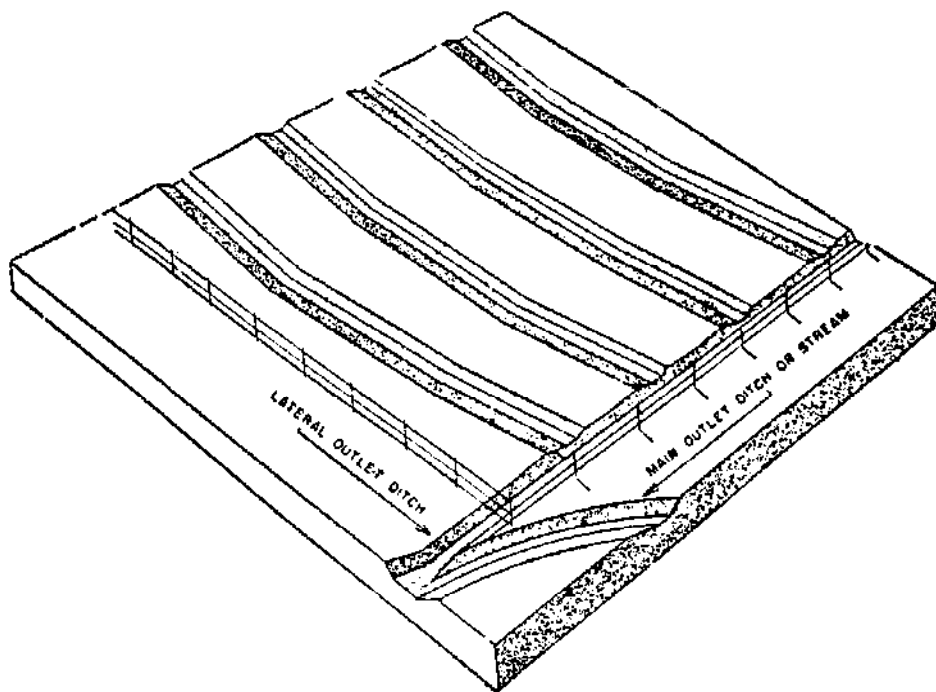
Random ditch system of surface drainage. The lateral outlet ditch should be a half foot to a foot deeper than the random field ditches.
